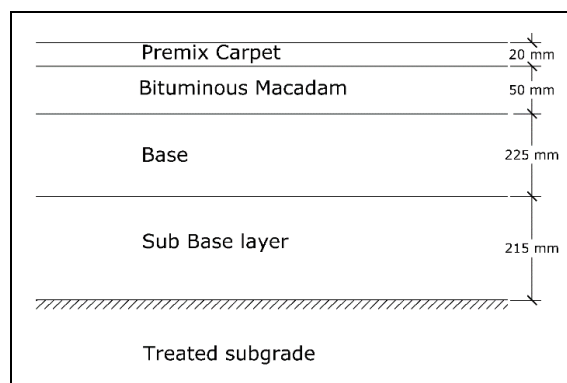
Pavement design without buffer layer (subgrade stabilized with tyre scraps)
